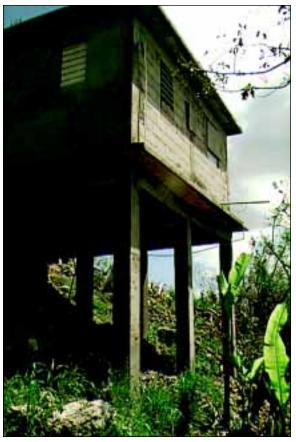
Residential building supported atop tall, unbraced concrete columns. This type of unbraced support column was common in many areas.
